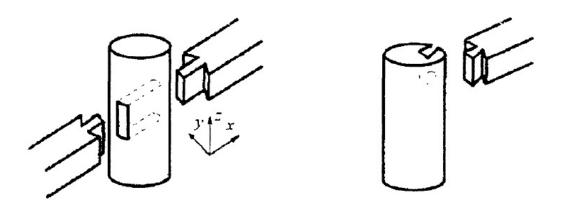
Profile of straight tenon & swallowtail tenon (Pics from Shukai Ya, 2017)
